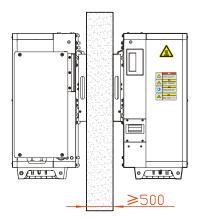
Back-to-back installation space requirements (unit: mm)
